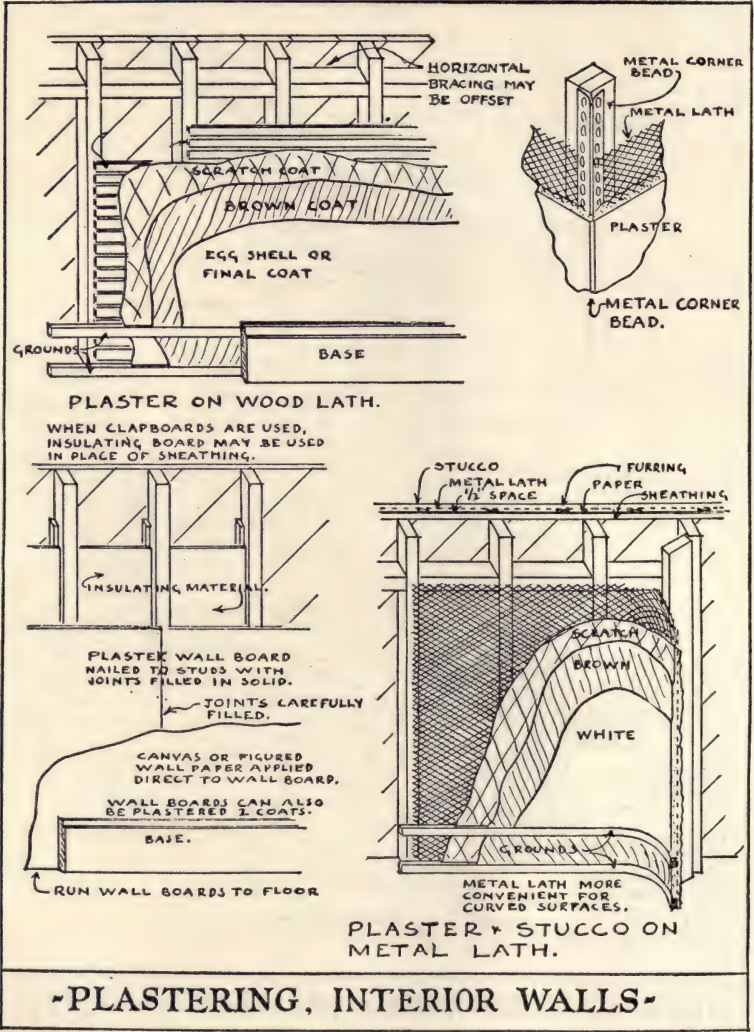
Plastering is a craft requiring skilled working of the material. Time must be allowed for the plaster to dry out before applying trim or paint. Strips of metal lath applied to interior corners where wood lath is used will prevent cracks.
